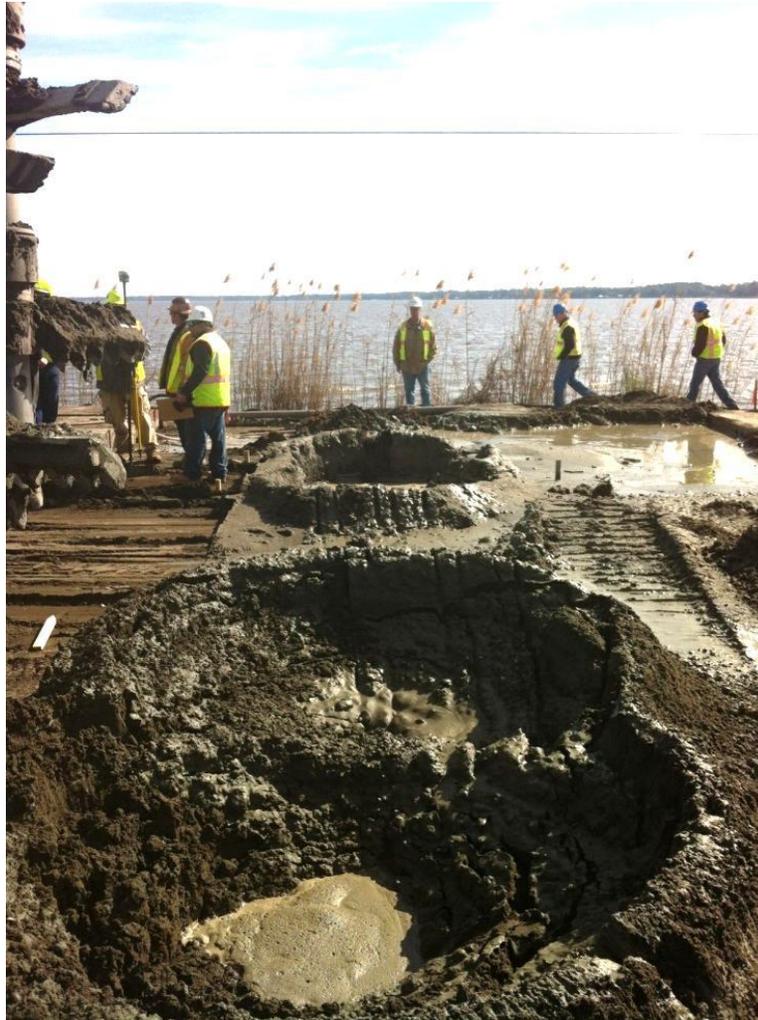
Soil mixing spoils around twin auger soil mixed demonstration elements.
